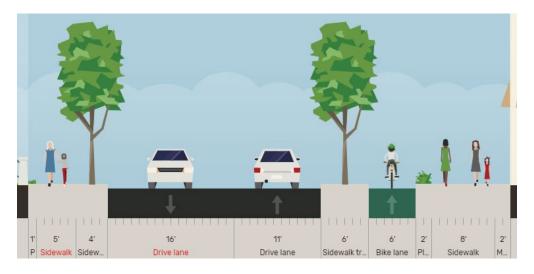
Ultimate Hillcrest Avenue Cross Section
